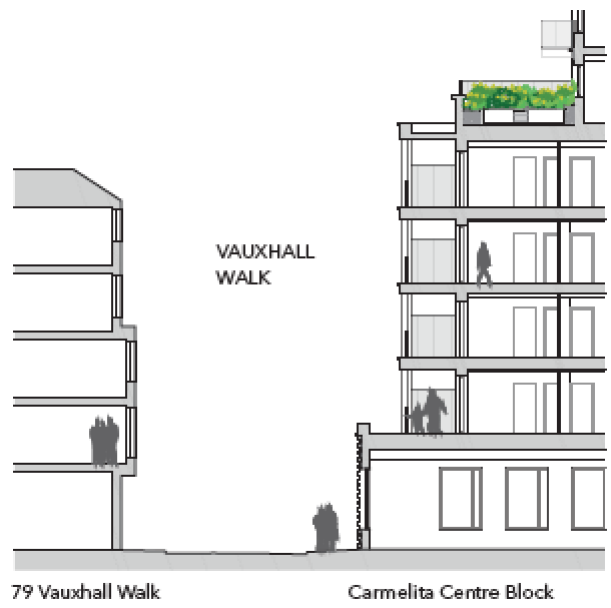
Relationship between proposed building and 79 Vauxhall Walk (source: Design and Access Statement)
